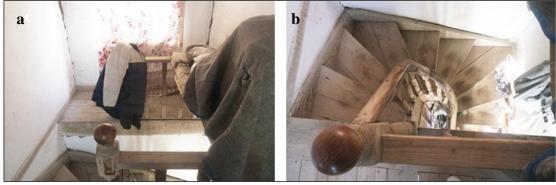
Mustafa Orşahin's House first floor a. Banister (trabazan / drabazan); b. Stairs (S.Sevimbige archive, 2017)
